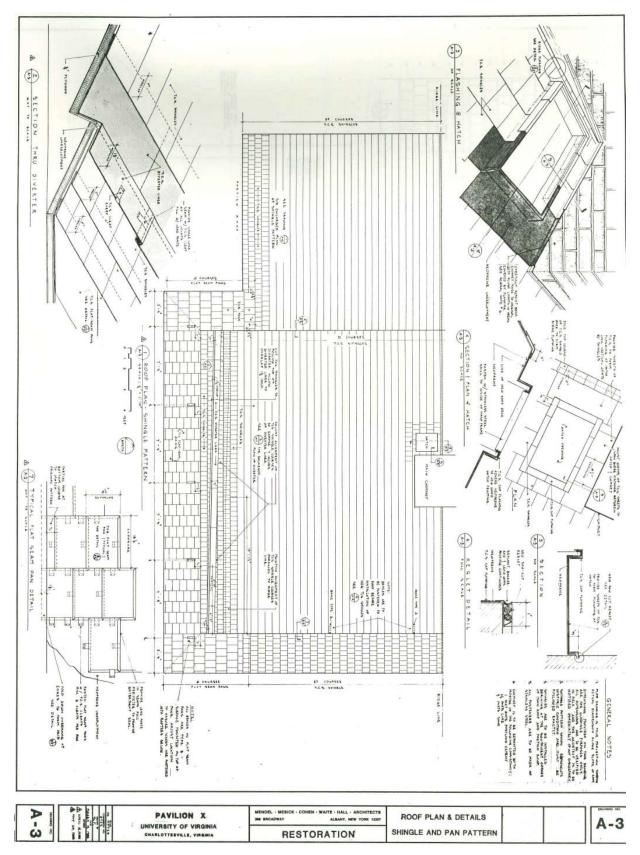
Pavilion X Roof Restoration. Sheet A-3 Roof Plan and Details. Shingle and Pan Pattern. Mendel Mesick Cohen Waite Hall Architects. March 1986.
